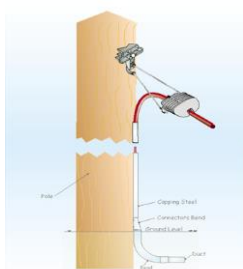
Transition from underground to overhead - use sub-duct and capping steel
